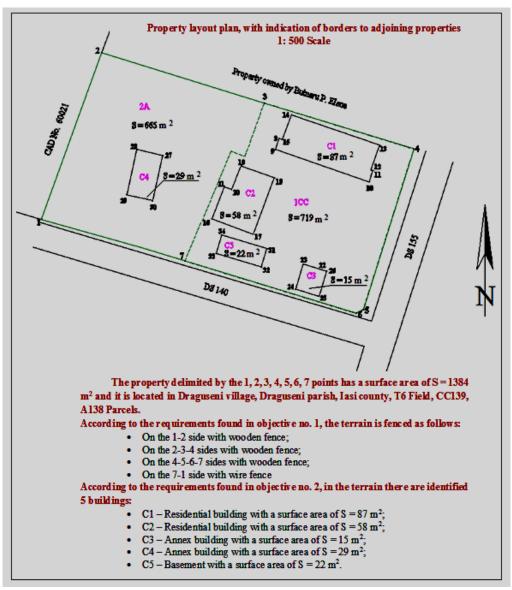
Property layout plan, with indication of borders to adjoining properties corresponding to the property located in the built-up area of Draguseni village
